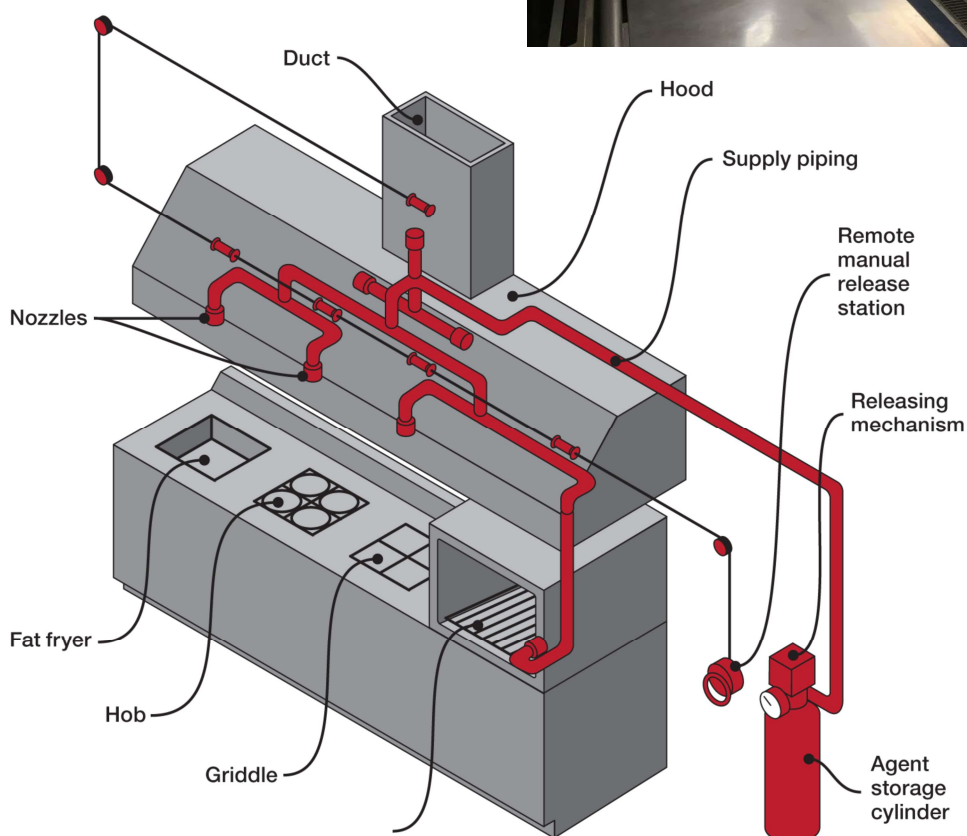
Typical layout and components of a kitchen fire suppression system.
